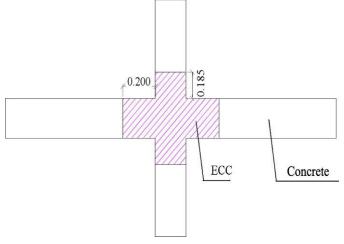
ECC in Beam-Column Connection (Salahuddin Qudah et.al)
